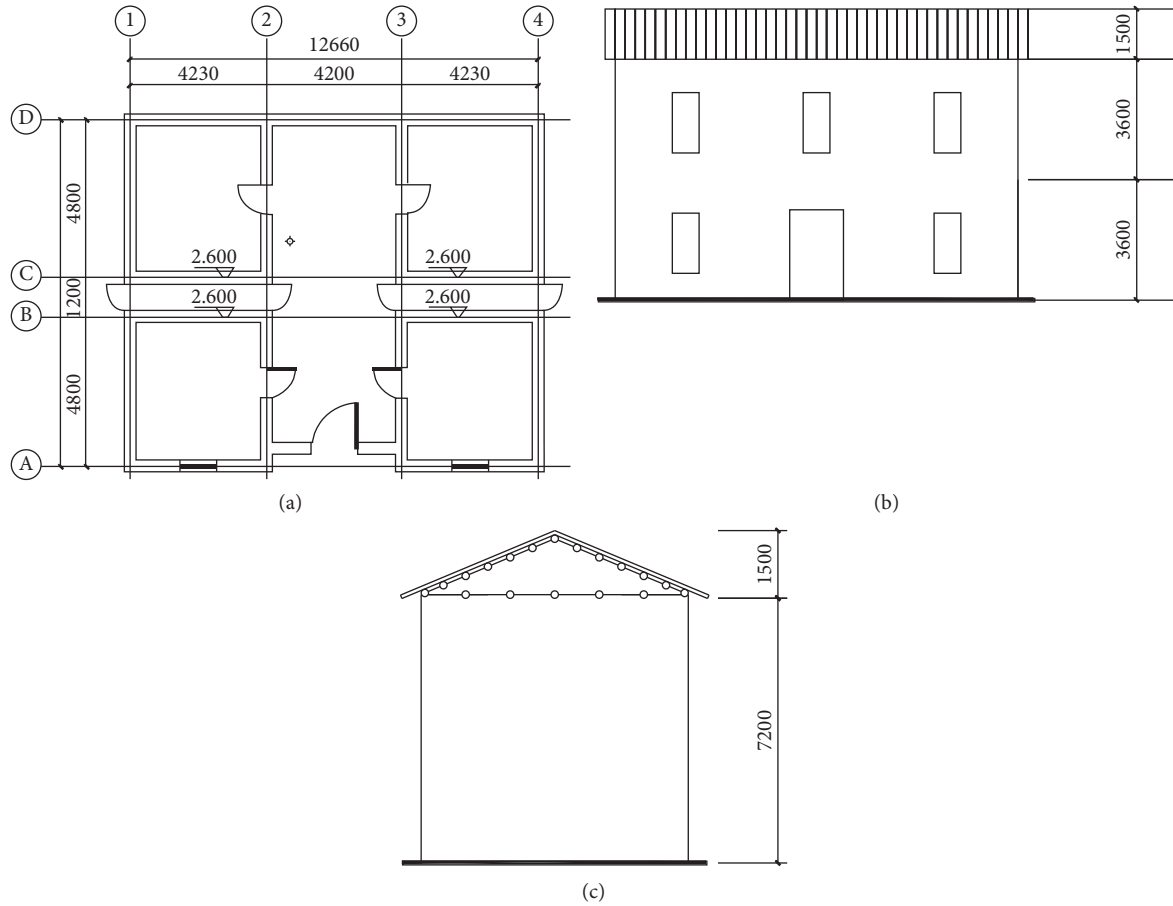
Architectural diagram of brick-wood structural house. (a) Layout plan of an engineering project. (b) Front elevation layout. (c) Model side elevation layout.
